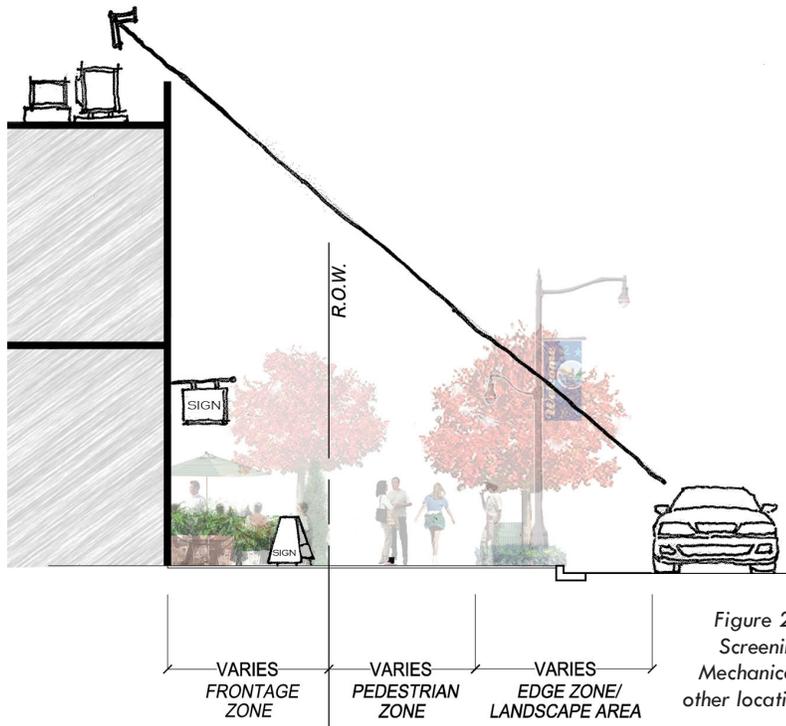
Example of Appropriate Screening for Mechanical Equipment. Mechanical equipment on rooftops and in other locations should not be visible from the street or sidewalk.
